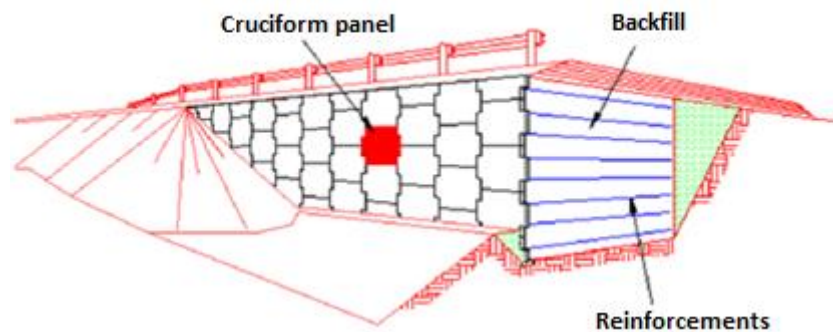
Reinforced Soil Retaining Wall (Alhaji Chehade et al., 2019d)
